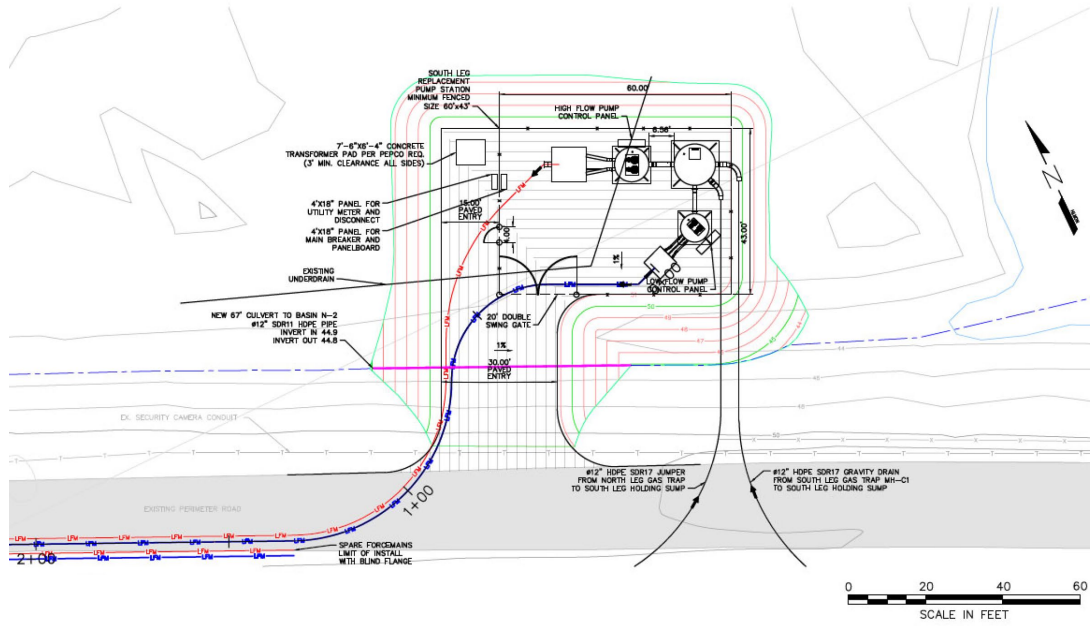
SOUTH LEG PUMP STATION LAYOUT
